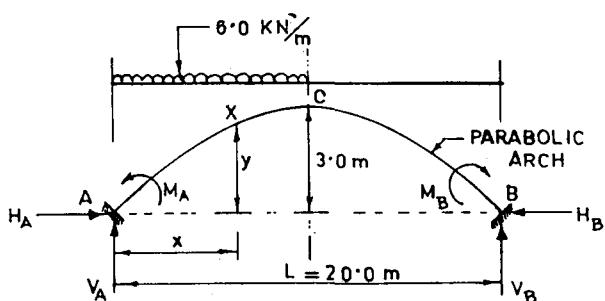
DETAILS OF ARCH (Example 13.1)
